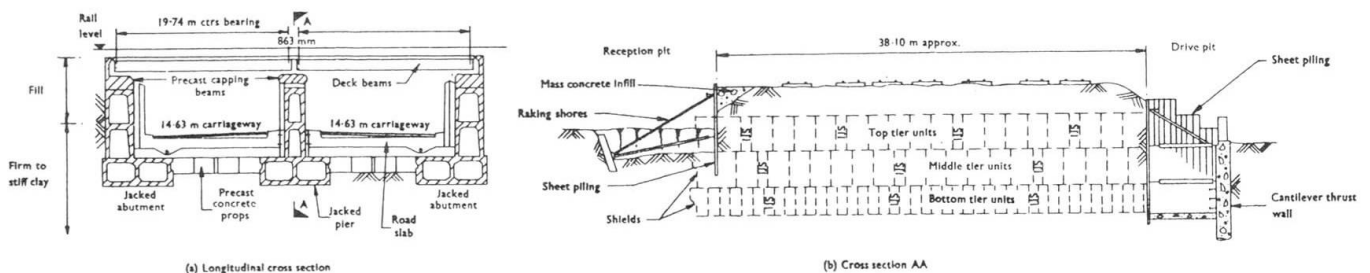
Three tier abutments and piers installed by jacking beneath railway at Old Ford, London
